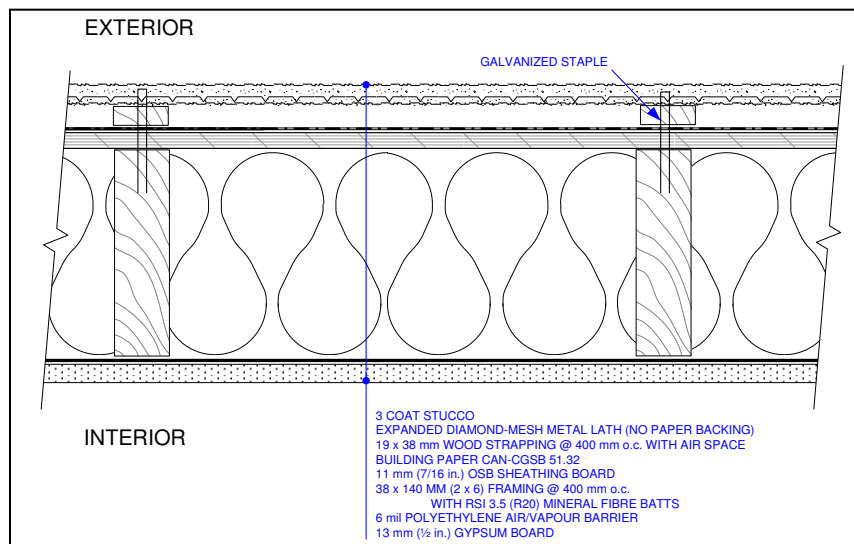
West and East coast solutions for stucco installation with capillary break
